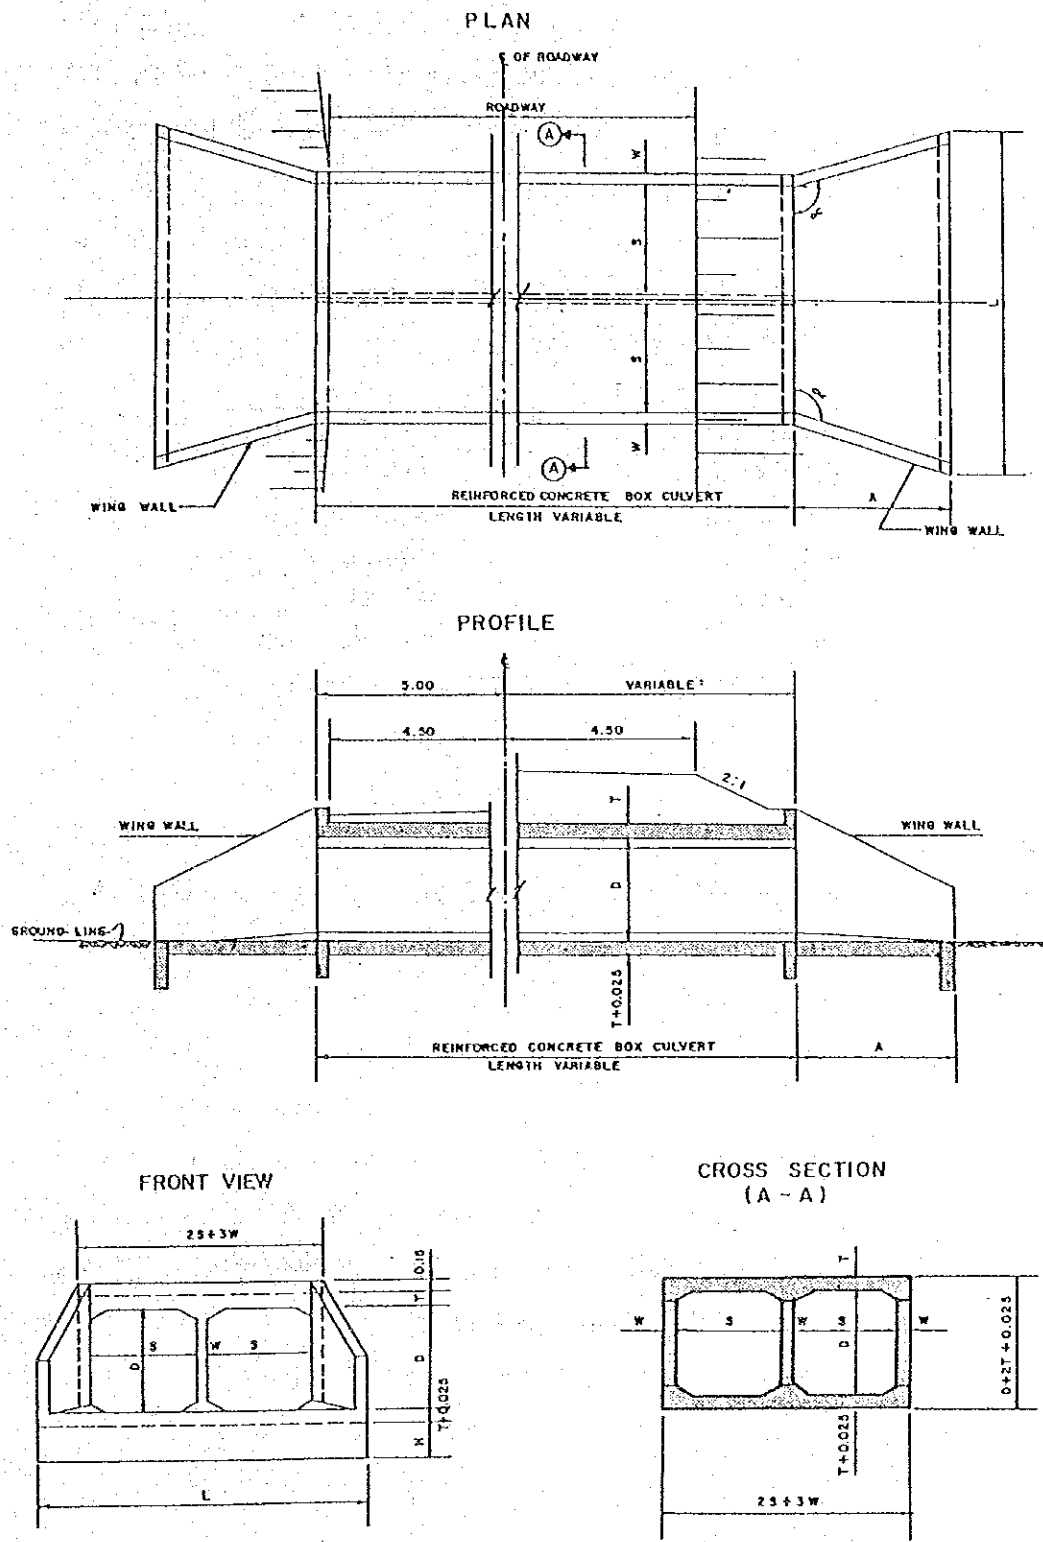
TYPICAL DESIGN OF BOX CULVERTS
